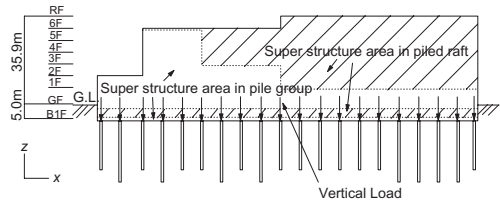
Construction areas of superstructure in stages of pile group and piled raft.
